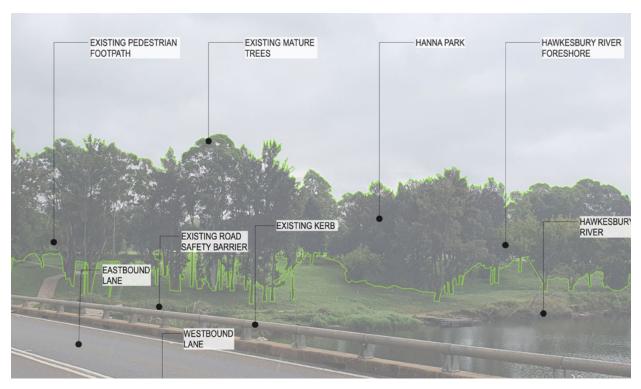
Viewpoint 3 - Existing view from the existing bridge (Bells Line of Road), facing towards North Richmond
